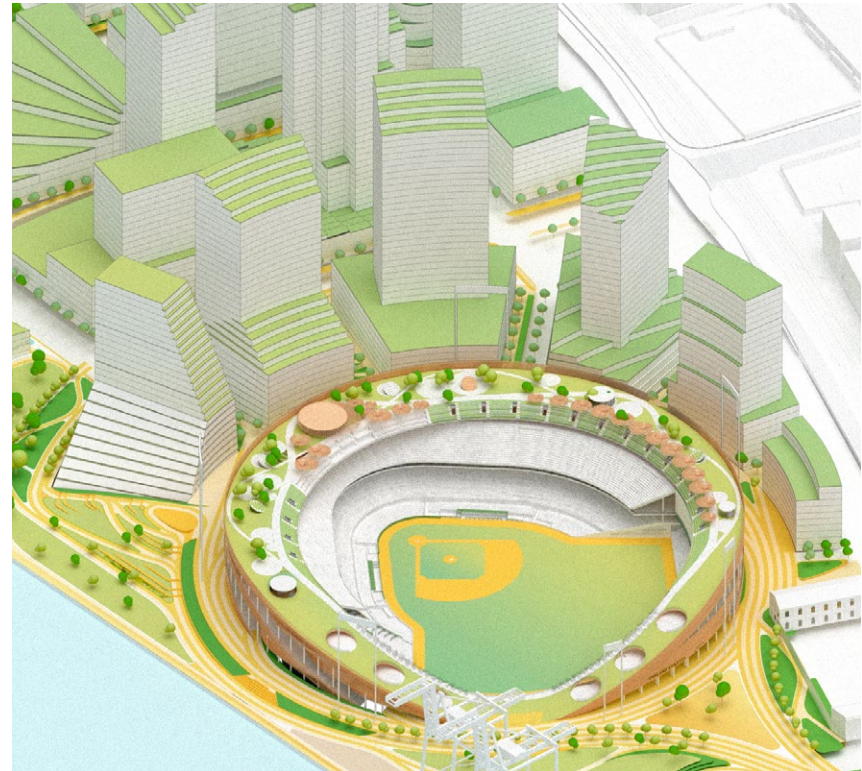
Rooftop terracing towards ballpark.
